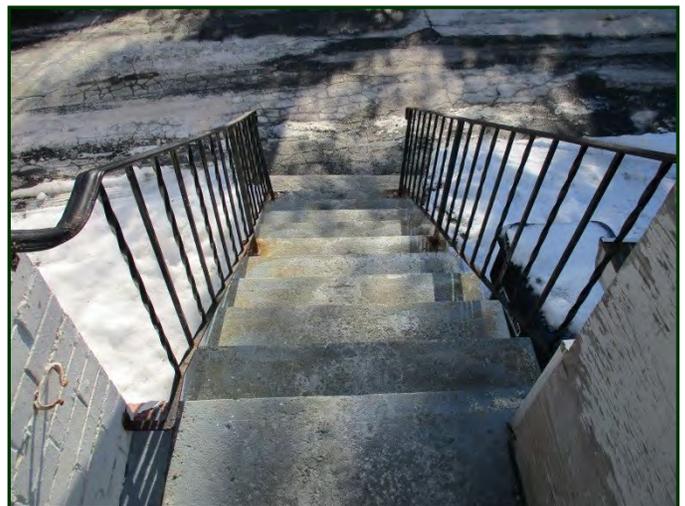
Concrete stairs with painted wrought iron railings at southwest corner of building. See previous photo
